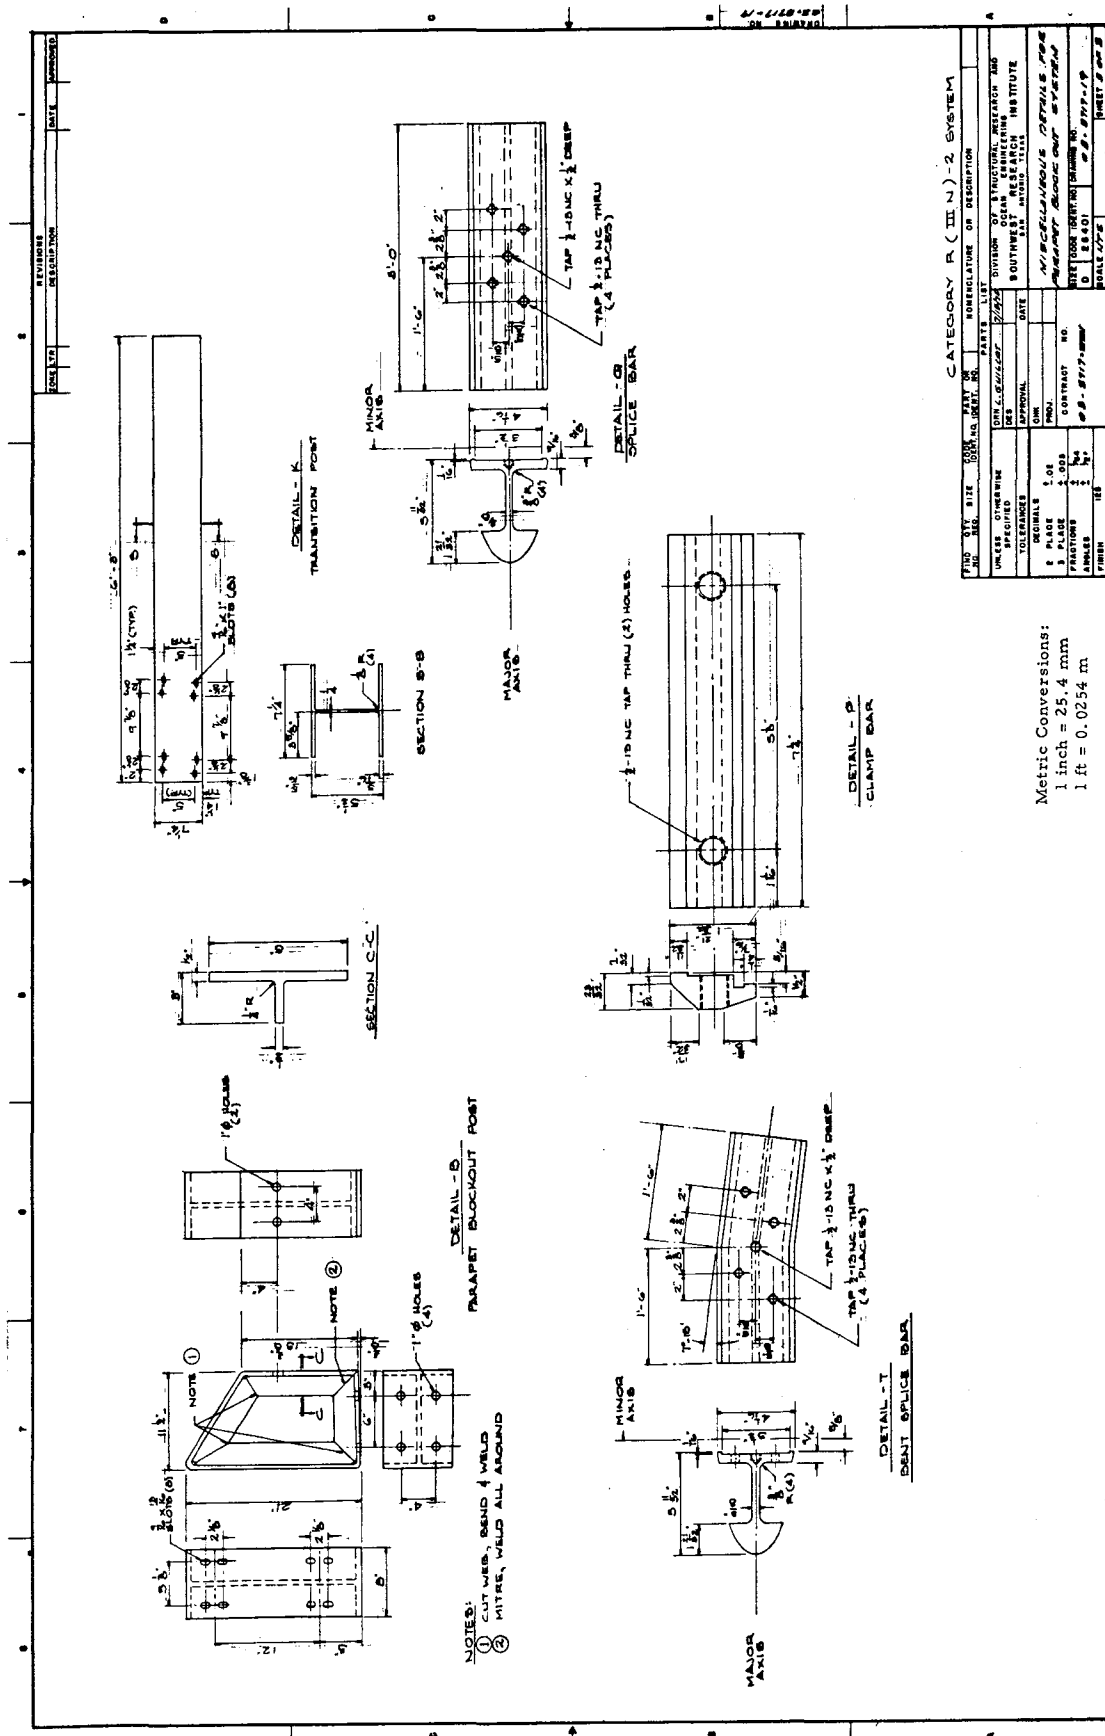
CATEGORY R(IIN)-2 INSTALLATION DRAWING
